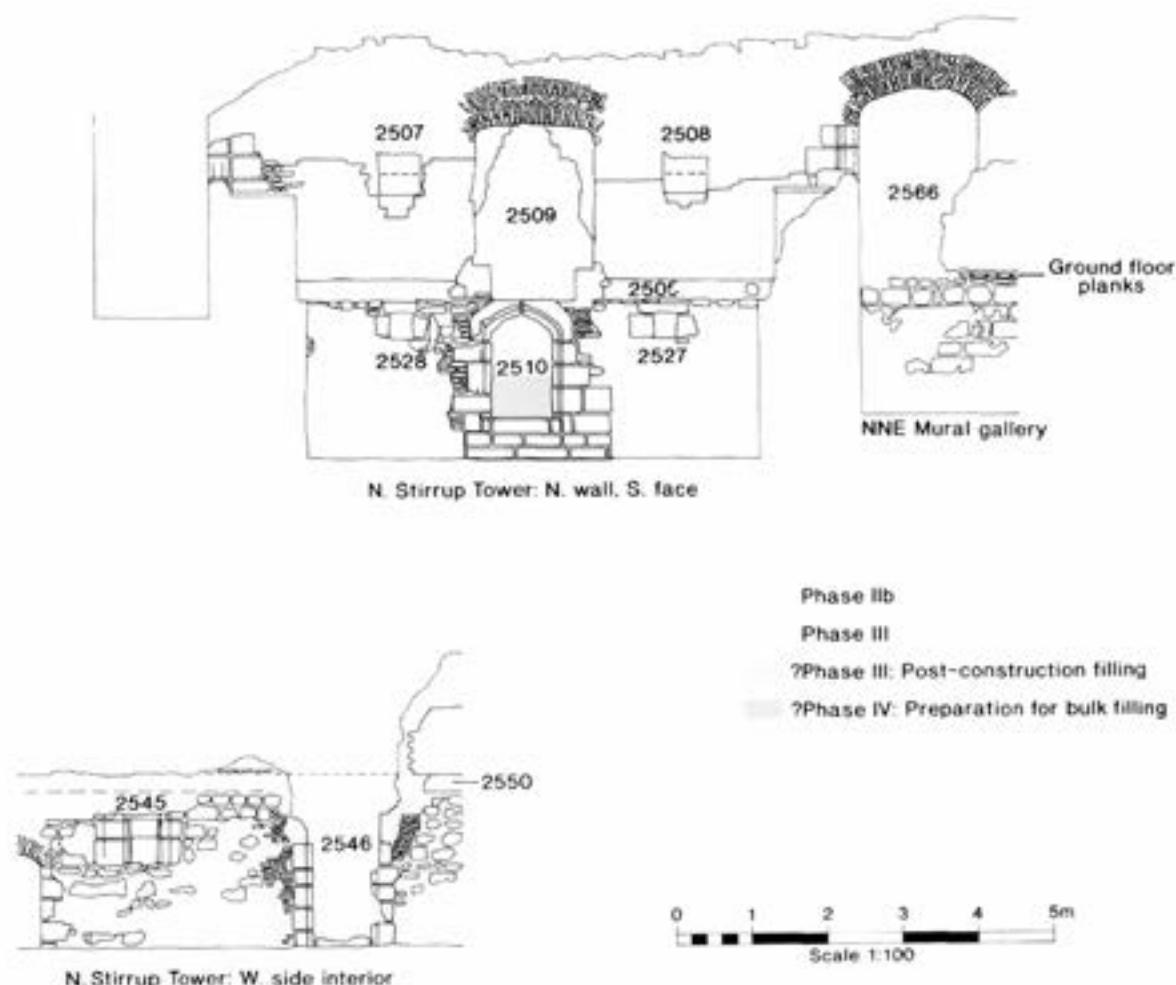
N Stirrup Tower elevations: chord wall south face; west side interior
